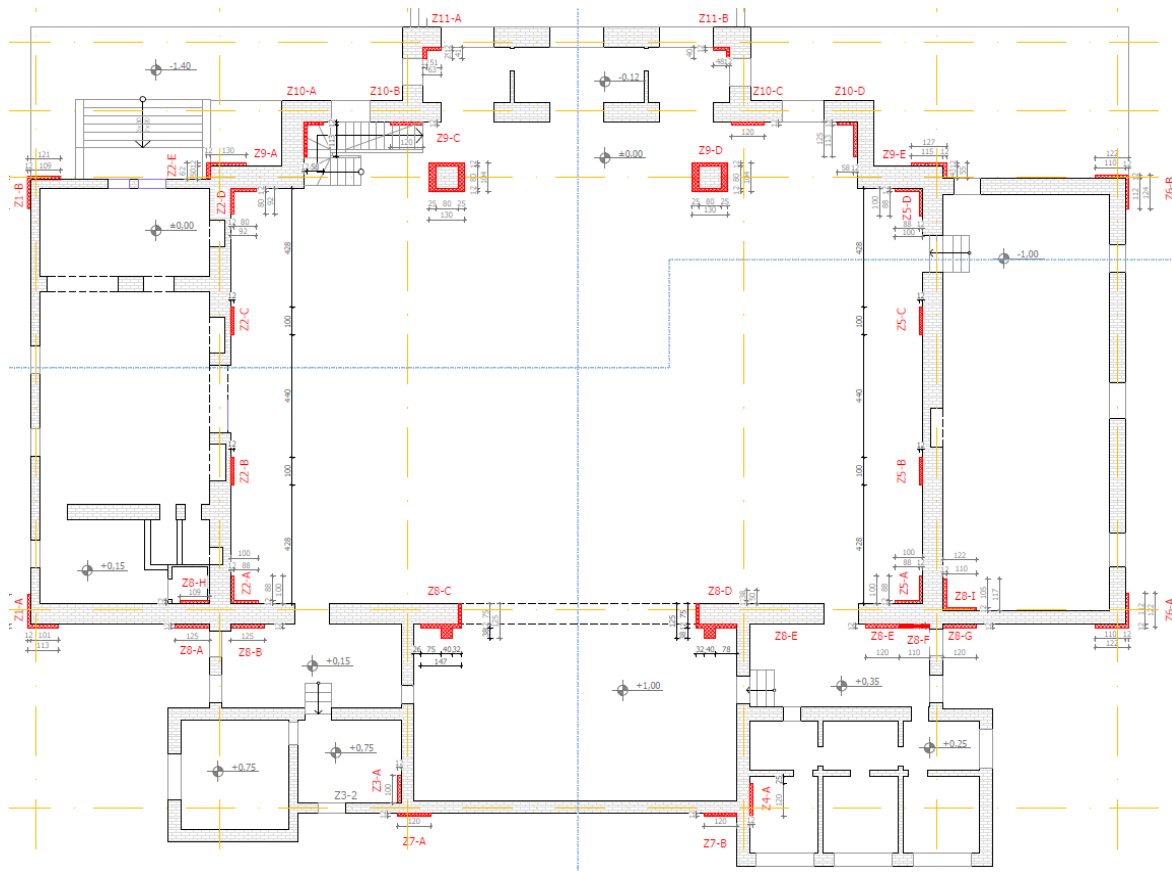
Formwork plan of the ground floor for the proposed strengthening solution
